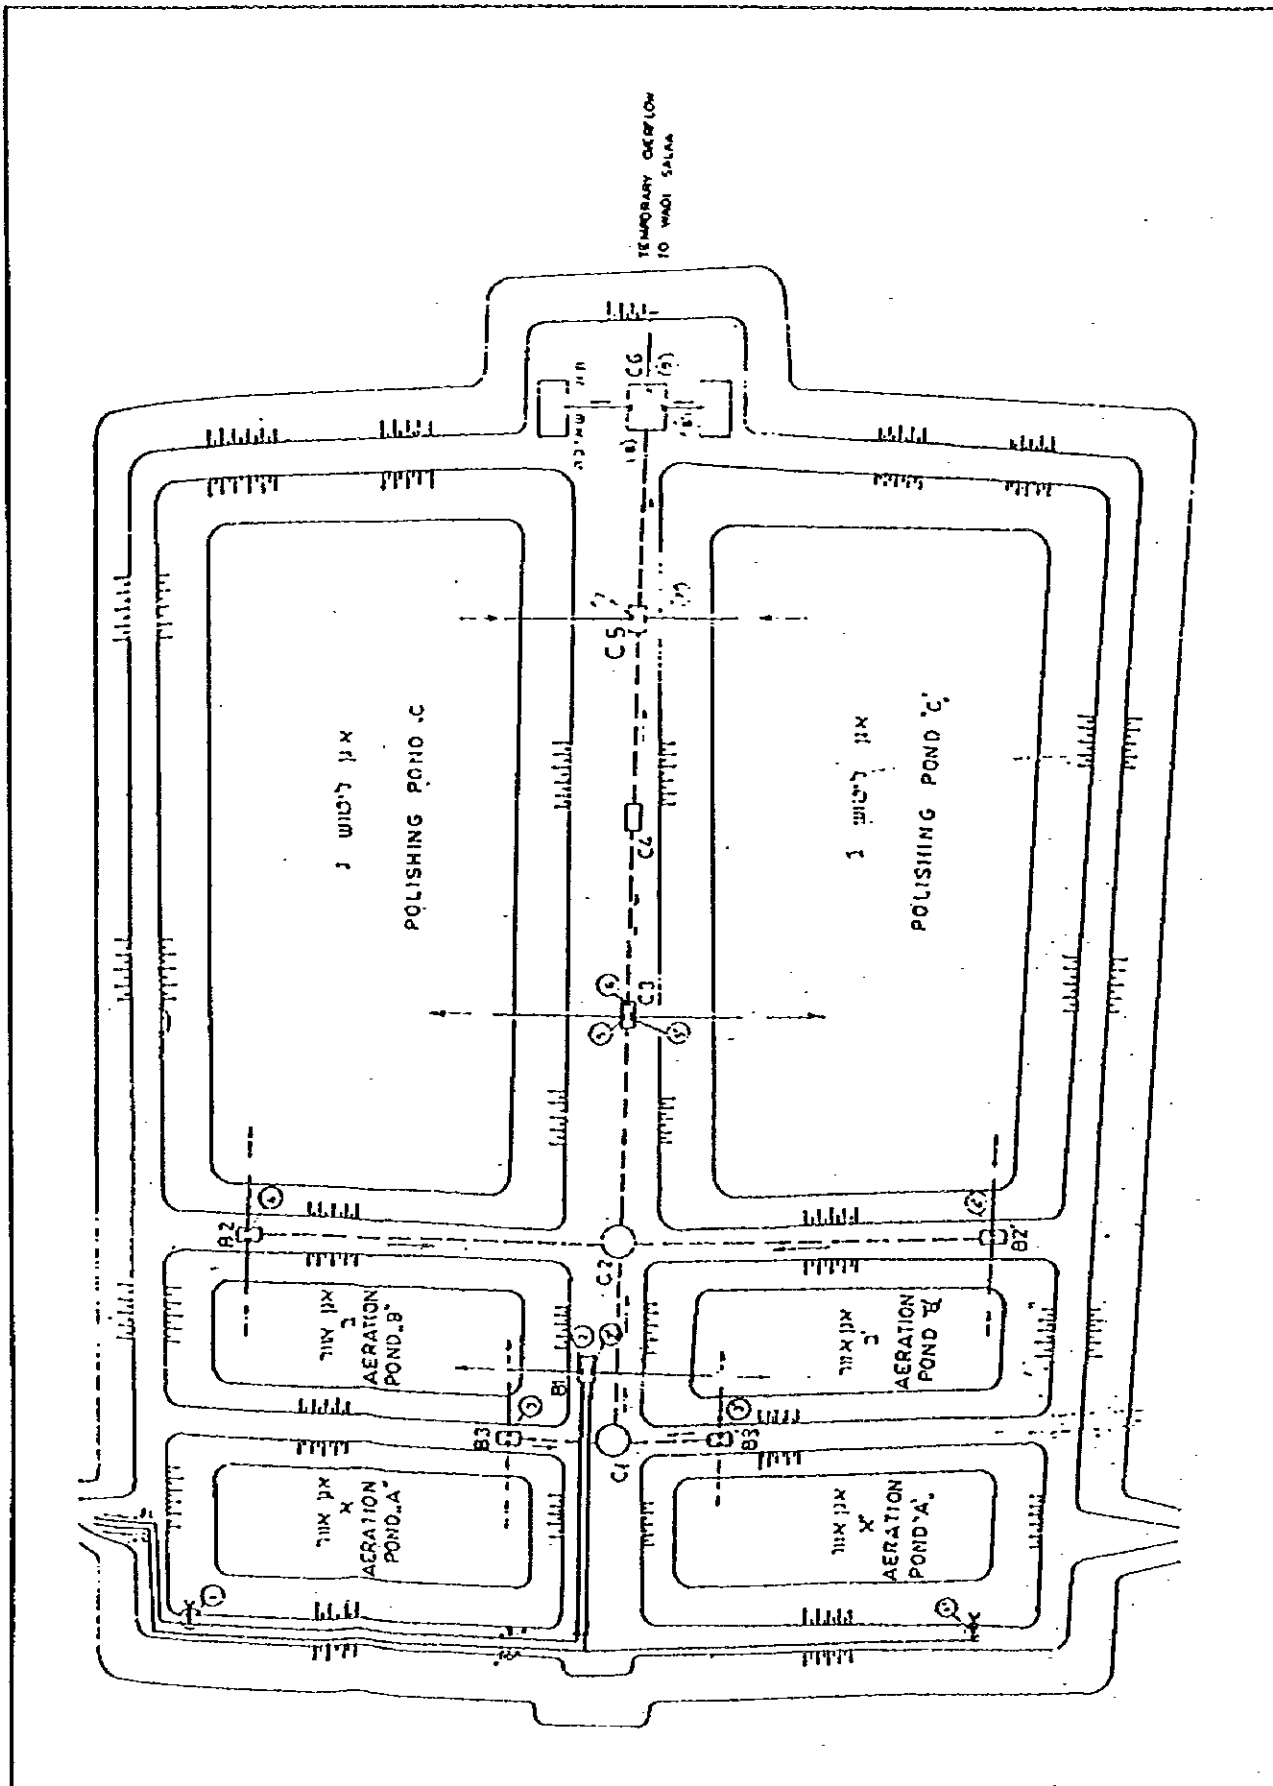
PLANNED SEWAGE TREATMENT PLAN FOR EXISTING SEWERAGE
